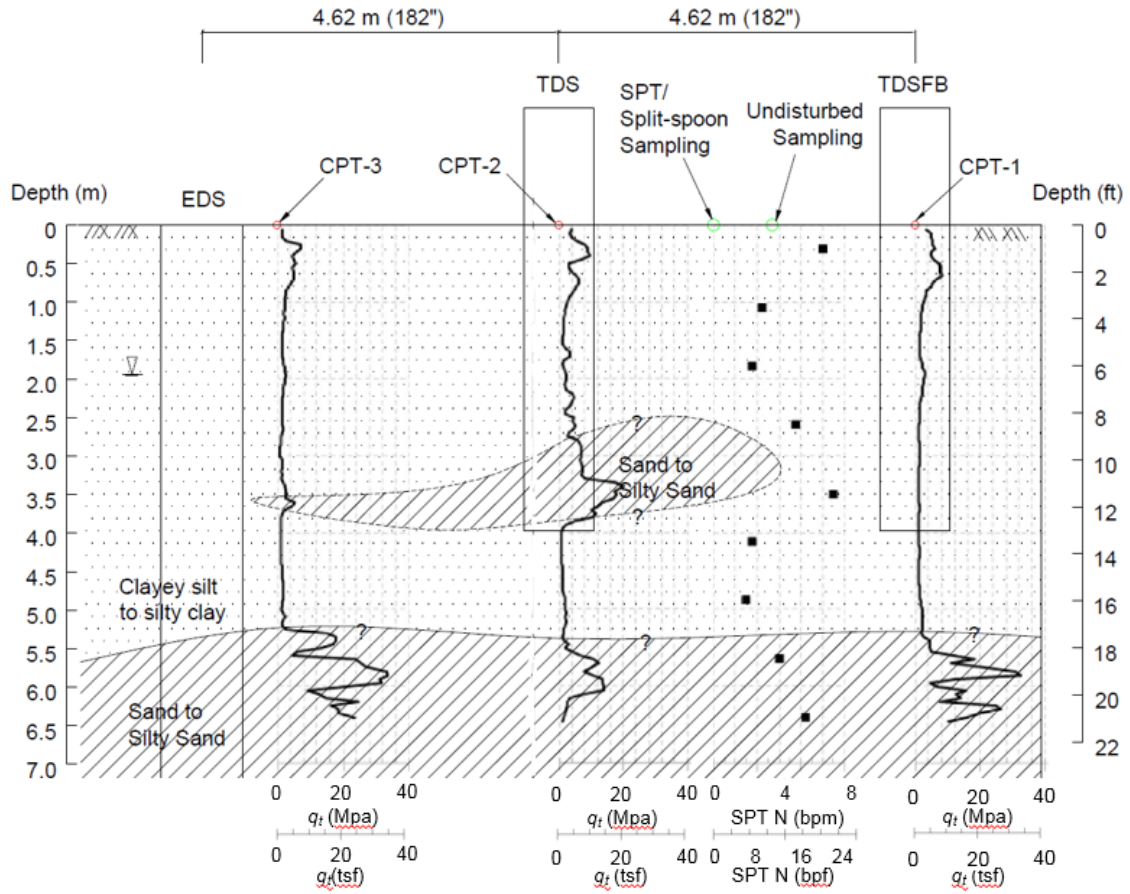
Subsurface profile at test site with the locations of test shafts and in-situ tests
